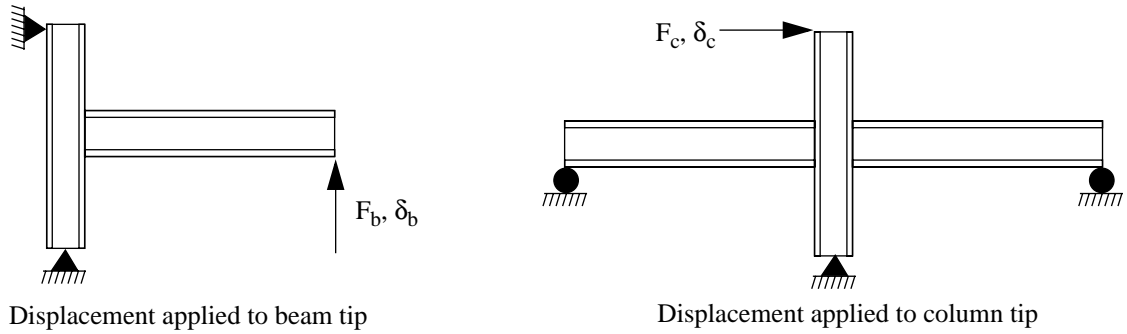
Possible Approaches for Loading Beam-Column Specimens
